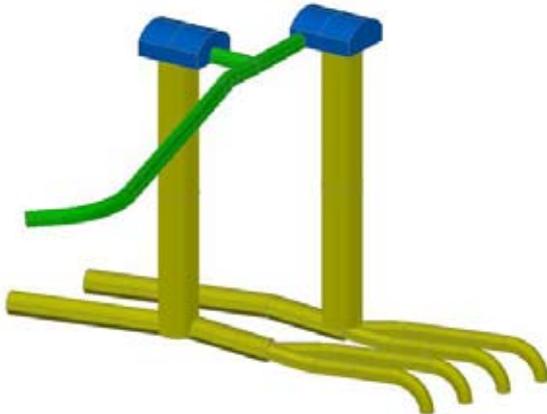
Arrangement of Shaft with Head Race Tunnel
